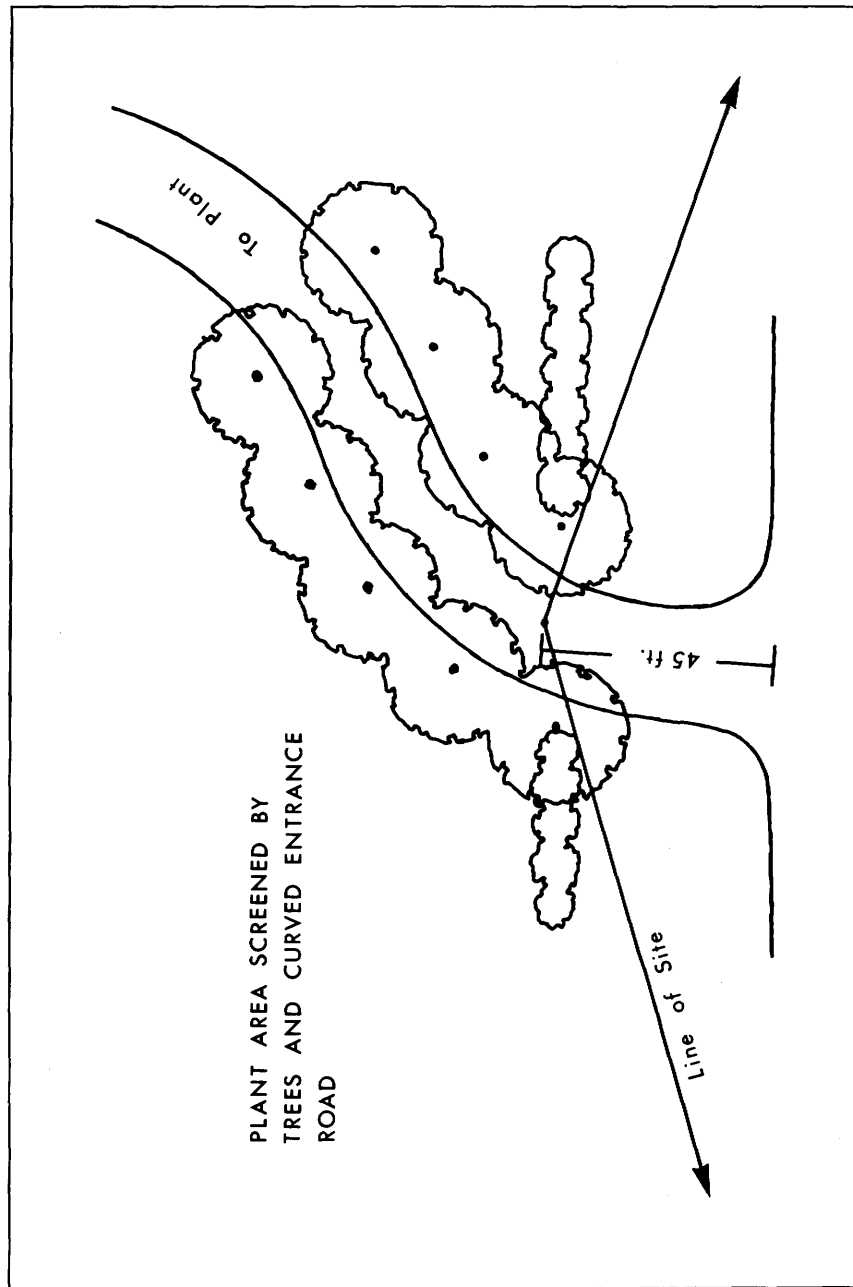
PLANTING DESIGN—PROCESSING PLANT AREA
